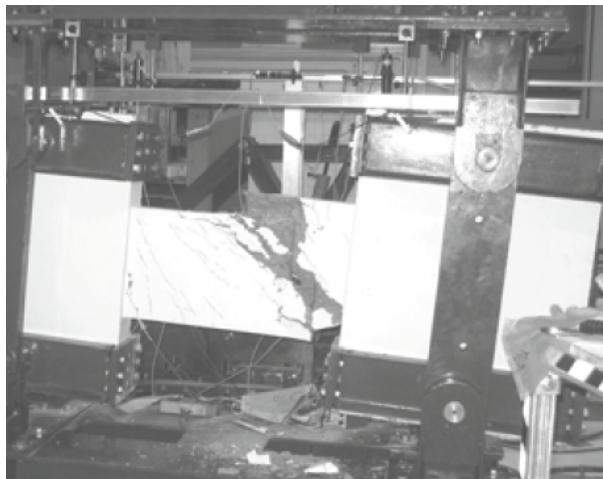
Test specimen for coupling beams (Kuang and Baczkowski, 2006)
